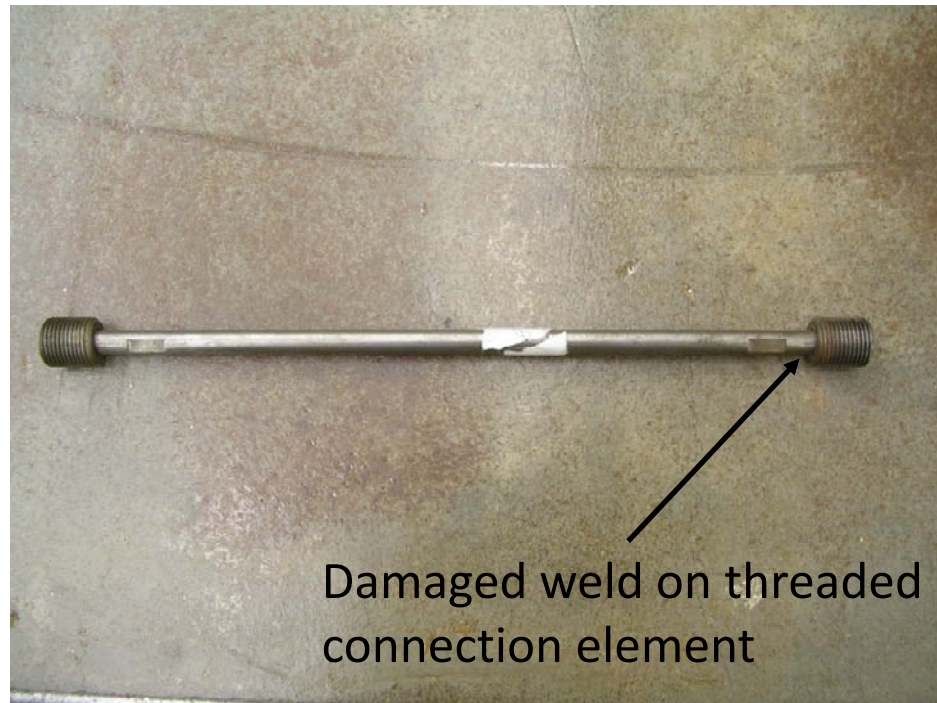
Damaged Element at Position Ten of the Test Structure
